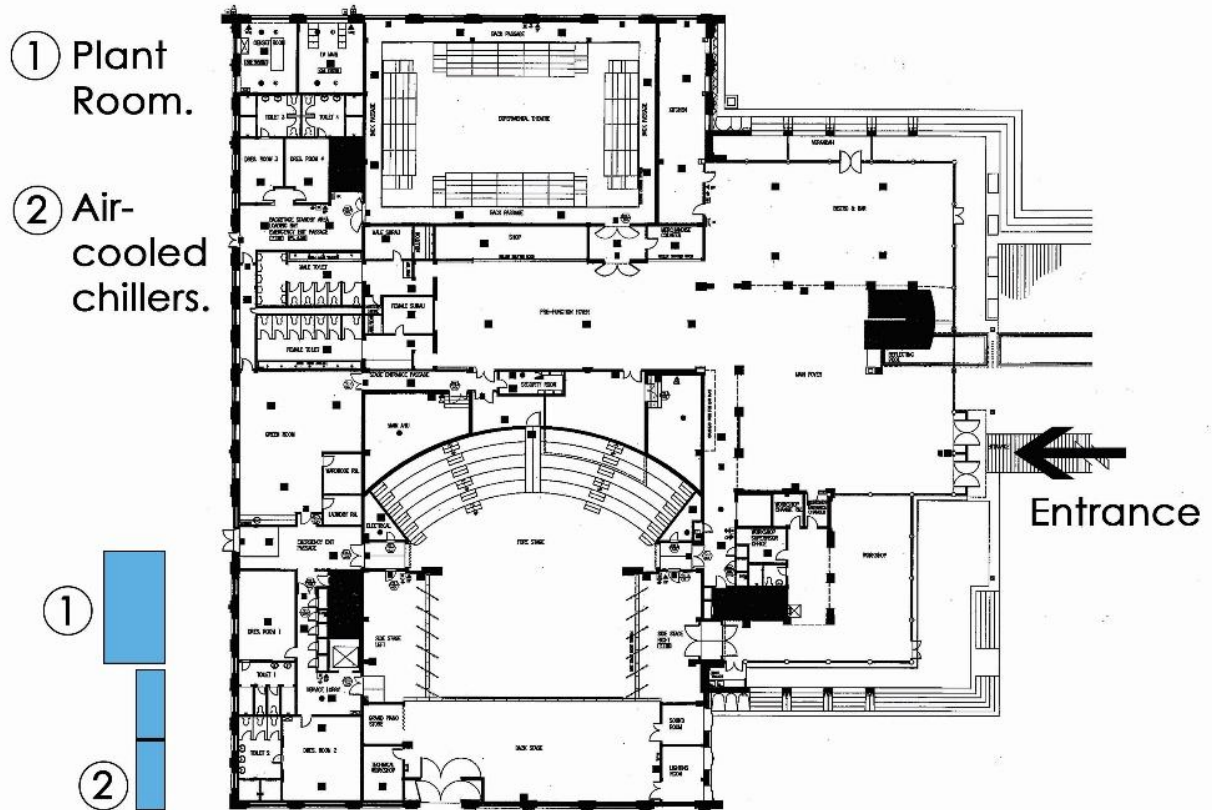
Floor plan of KLPAC showing the location of Plant room and air-cooled chillers.
